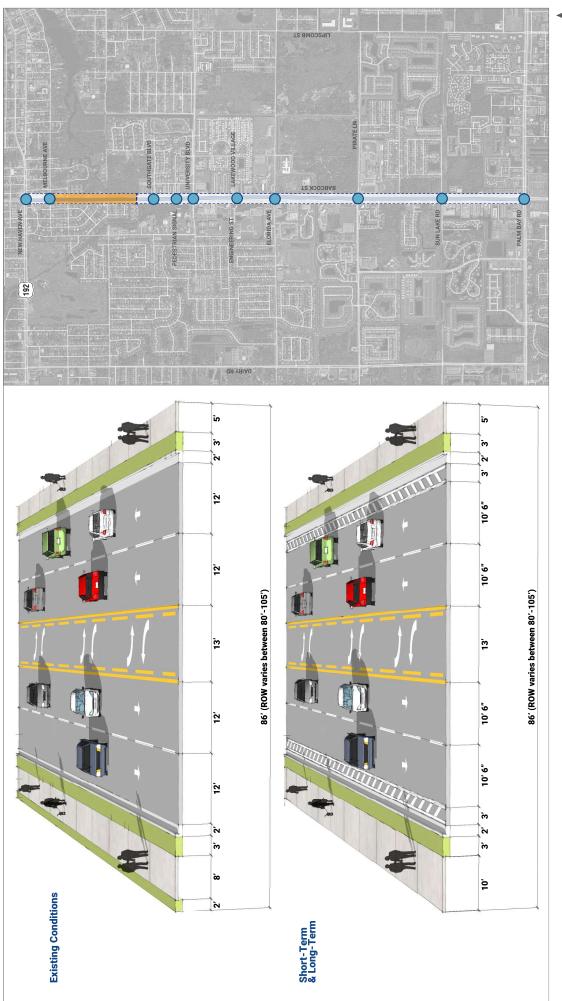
| Crane Creek Bridge to Melbourne Drive Typical Section
